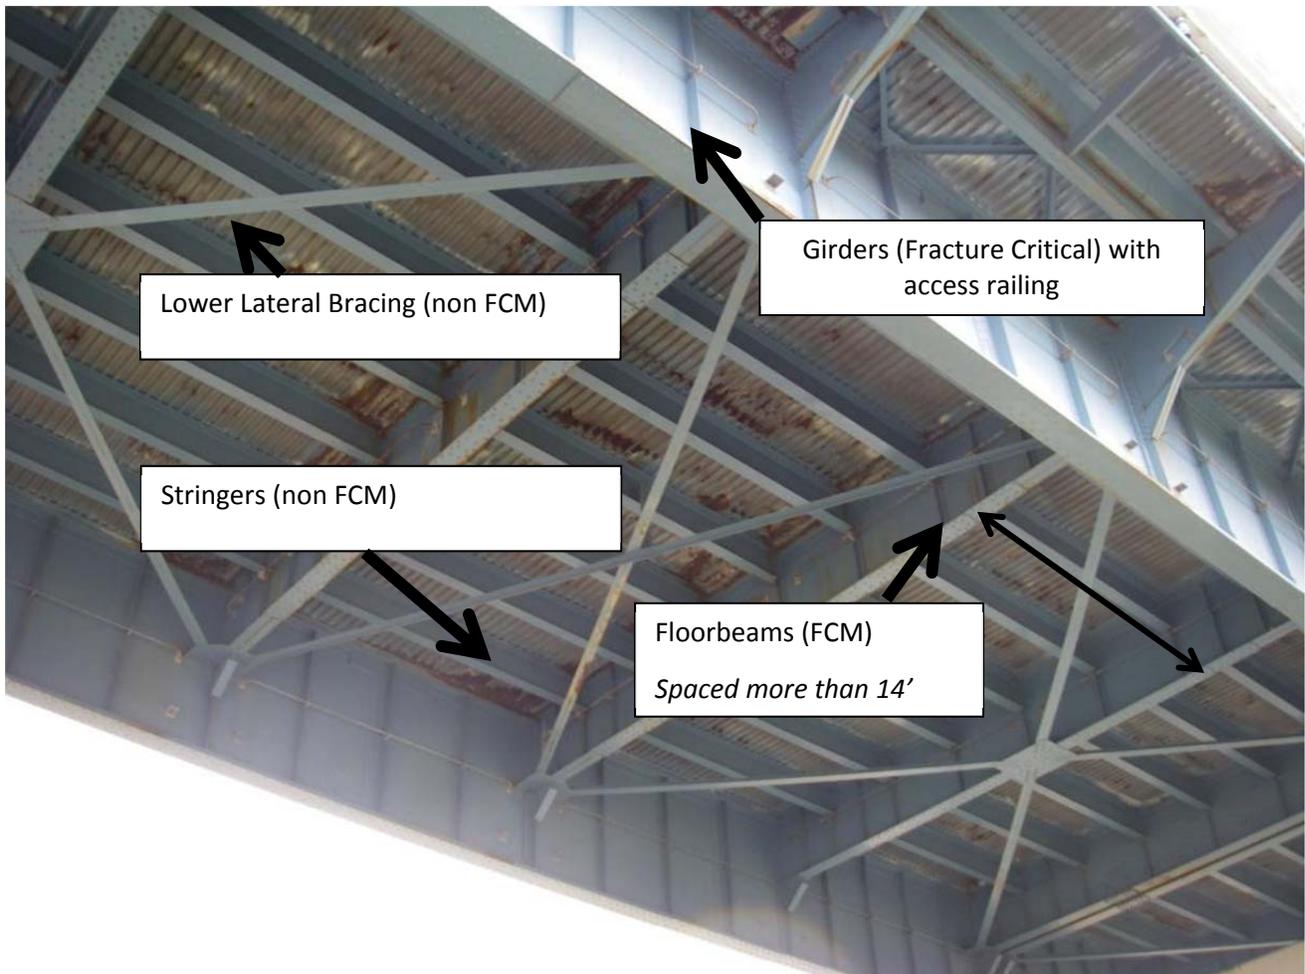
Fracture Critical Girder and Floorbeam
